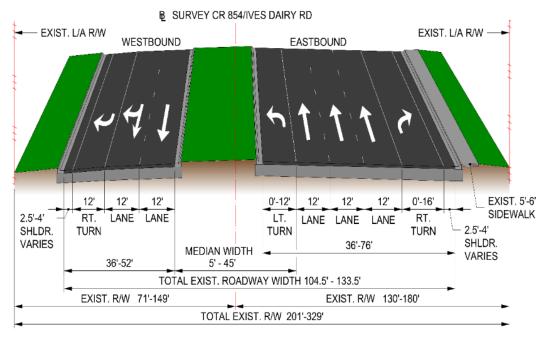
3: Existing Typical Section - CR 854/Ives Dairy Road
